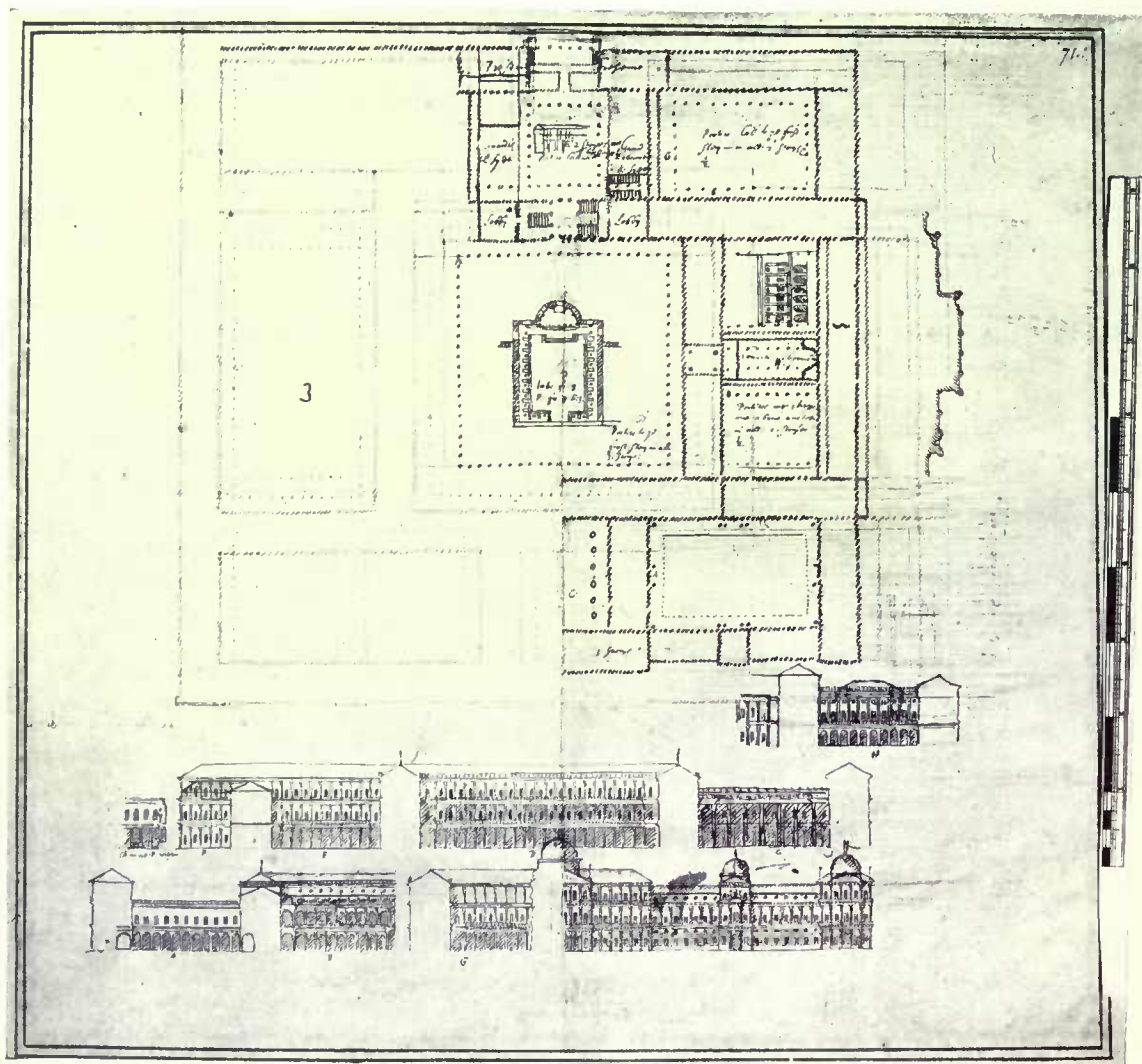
PRELIMINARY SKETCHES FOR THE GROUND-FLOOR PLAN AND ELEVATIONS OF THE CHATSWORTH B. SCHEME, BY WEBB
